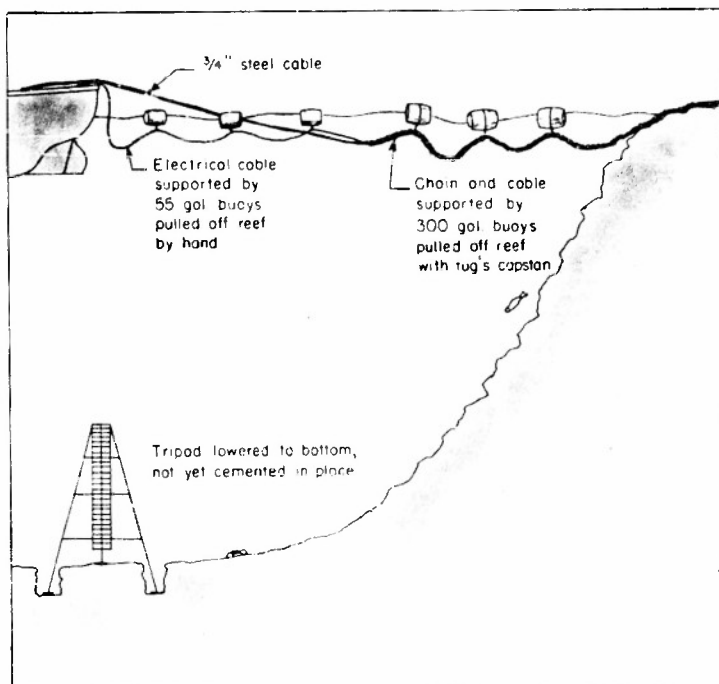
Schematic diagram of technique used to install cable at Ylig Bay
